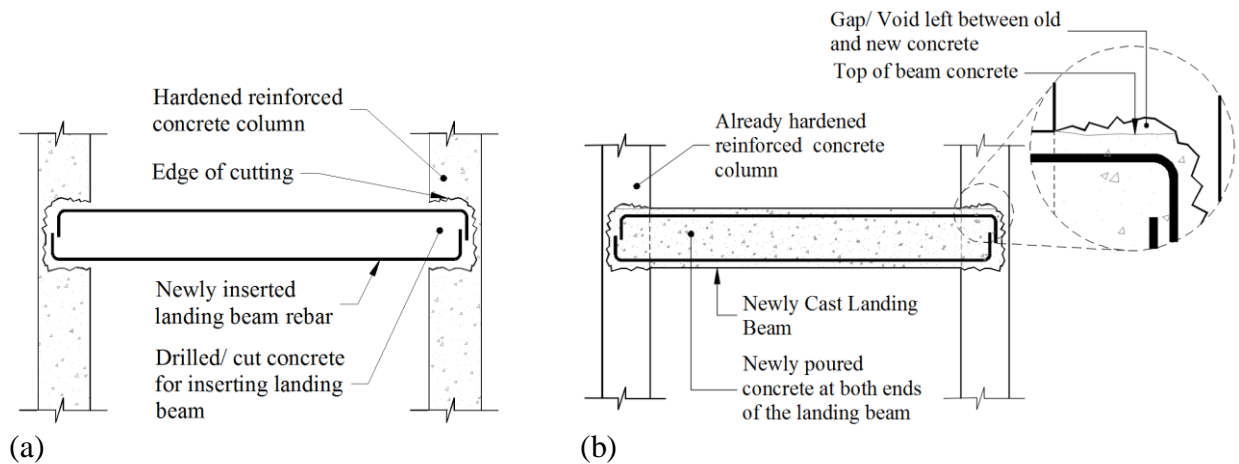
Deficiency Type I (a) Hardened column is drilled/cut and landing beam longitudinal reinforcement inserted. (b) Landing beam concrete is poured, a Gap/ Void is created due to concrete setting, concave up drilling/ cutting and concrete shrinkage.
